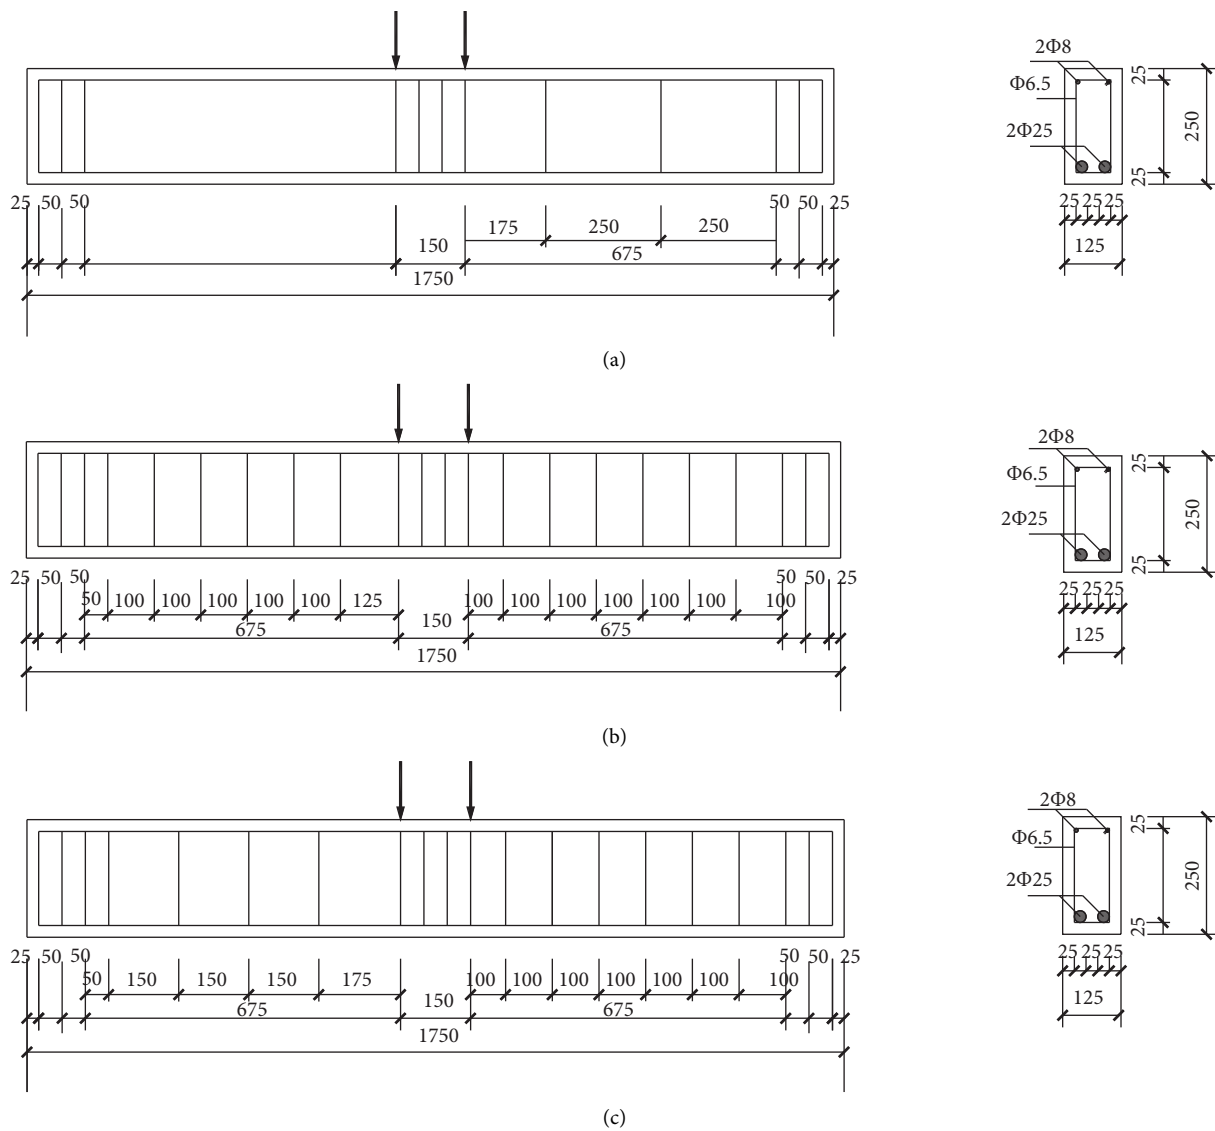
Geometry and reinforcement details of rectangular beams. (a) Stirrup ratio 0% (without stirrup). (b) Stirrup ratio 0.53% (SS100). (c) Stirrup ratio 0.35% (SS150).
